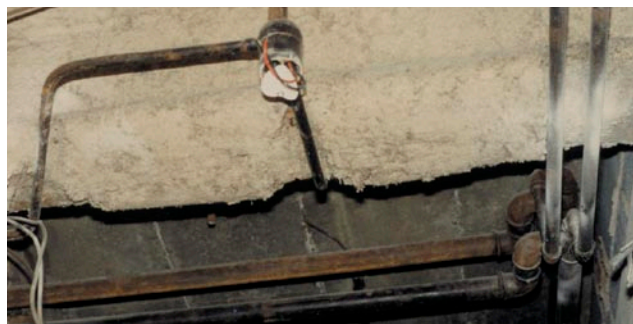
Poorly tamped sprayed chrysotile fireproofing on a structural steel beam holding up a concrete floor, showing some overspray onto the concrete and damage by electrical work
